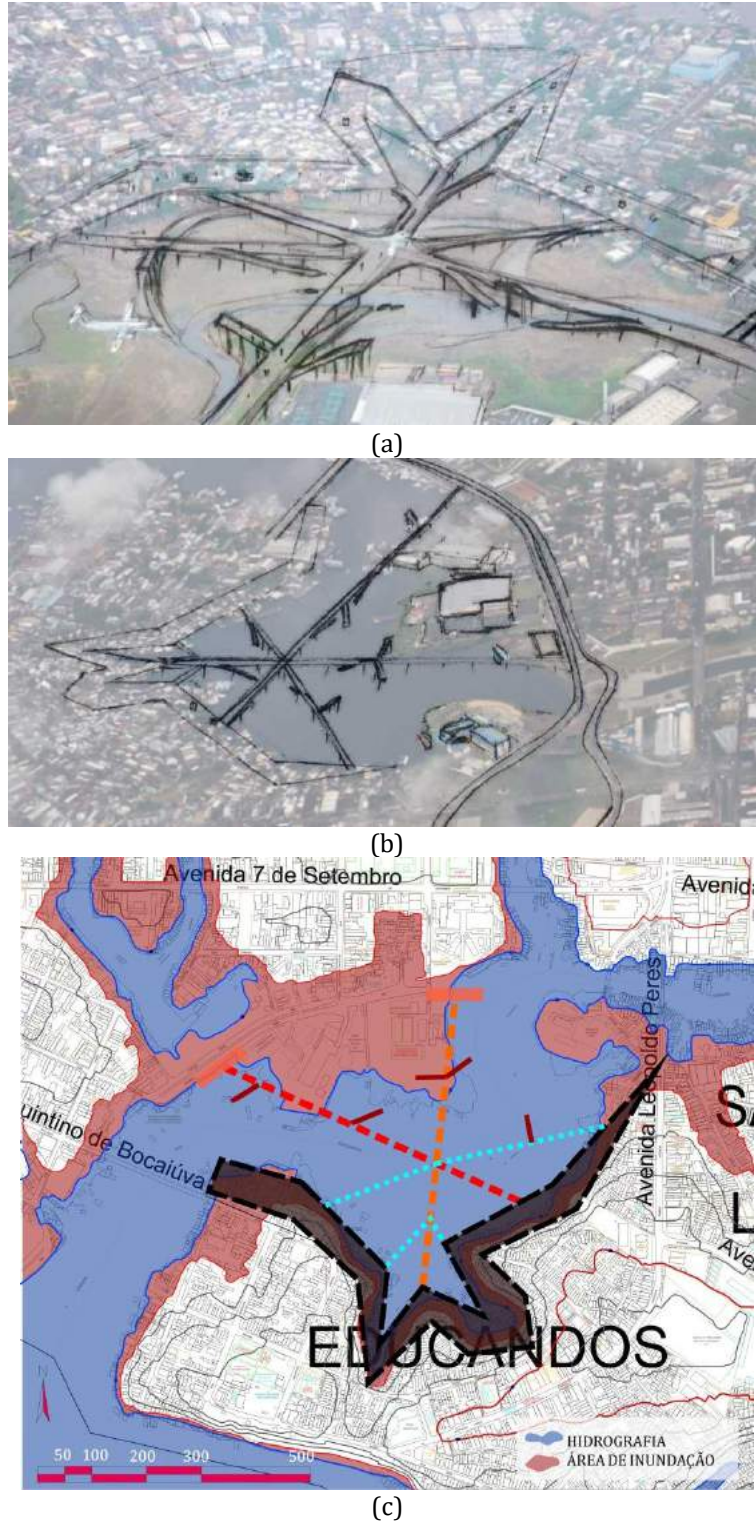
(a, b) Views of platforms, bridges and ramps. (c) Mobility plan. Source: Santana (2014).
